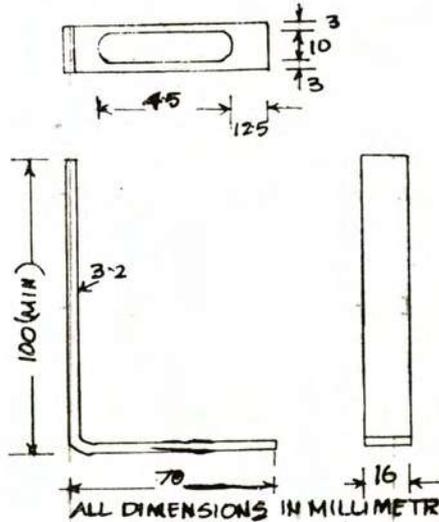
SLOTTED FIXING LUG FOR BRICK WORK AND MASONRY
